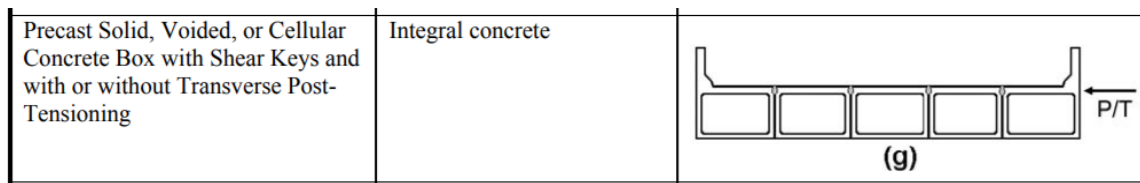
Type (g) Adjacent Box Beam Section [AASHTO LRFD]
